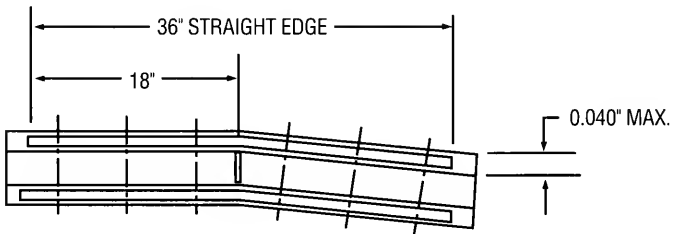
Plan View of Joint Showing Misalignment Tolerance in Horizontal Alignment per Section 6.2.
